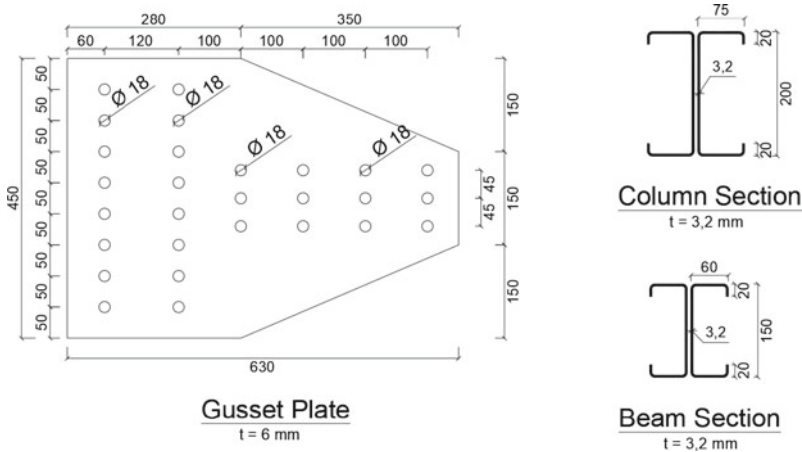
Details of gusset plate, cross section of specimen column and beam
